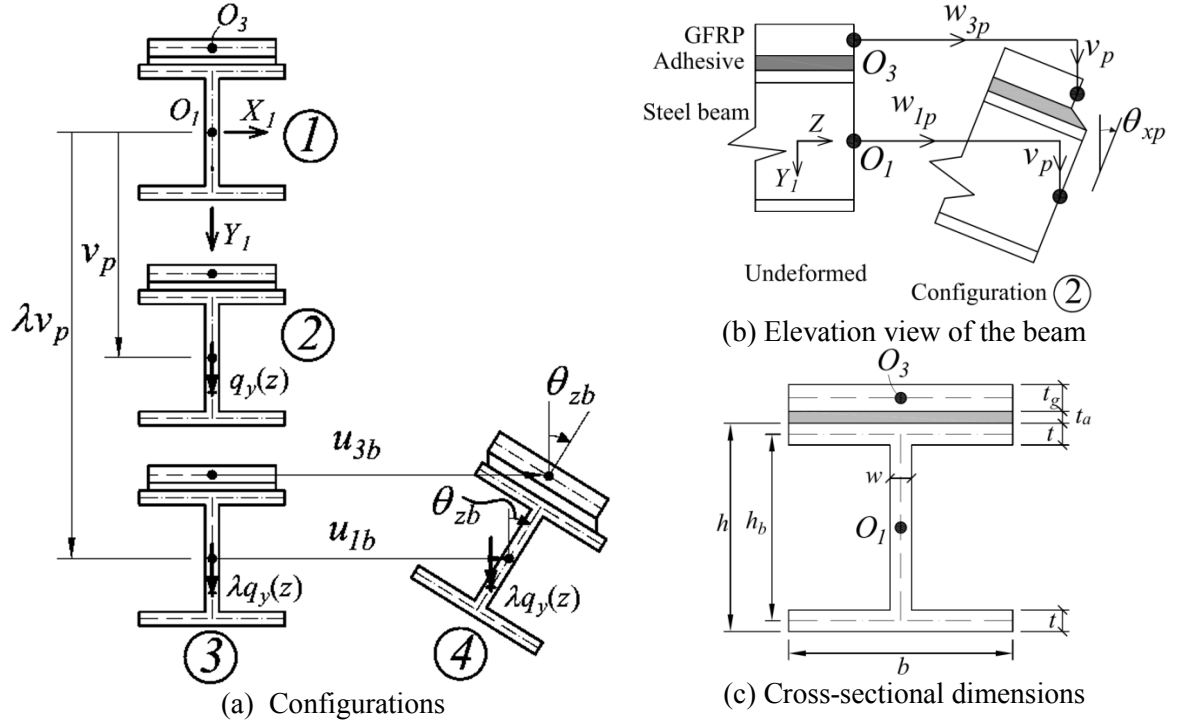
Beam configurations (a, b) and cross-sectional dimensions (c)
